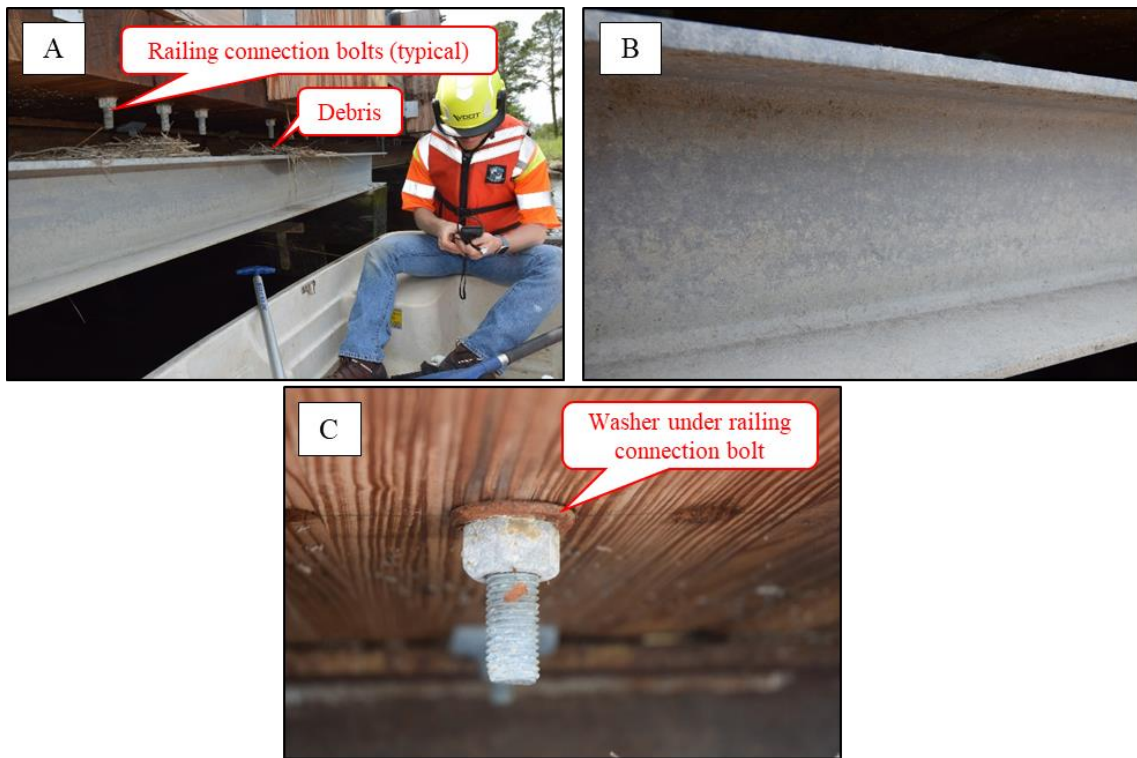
Photographs of Galvanized Nonstructural Beam on Chesapeake Bay Side of the 2022 Holdens Creek Bridge: (A) general view; (B) close-up of beam; (C) close-up of railing connection bolt above beam.
